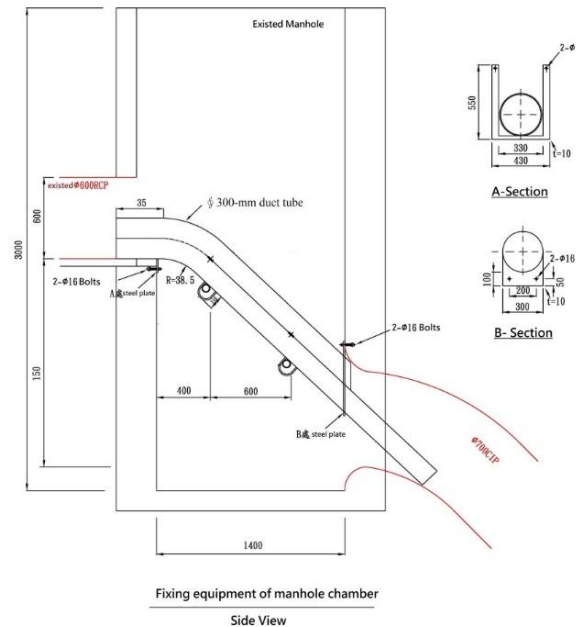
$\phi$  300mm duct tube connecting a horizontal section and a sloping section.
